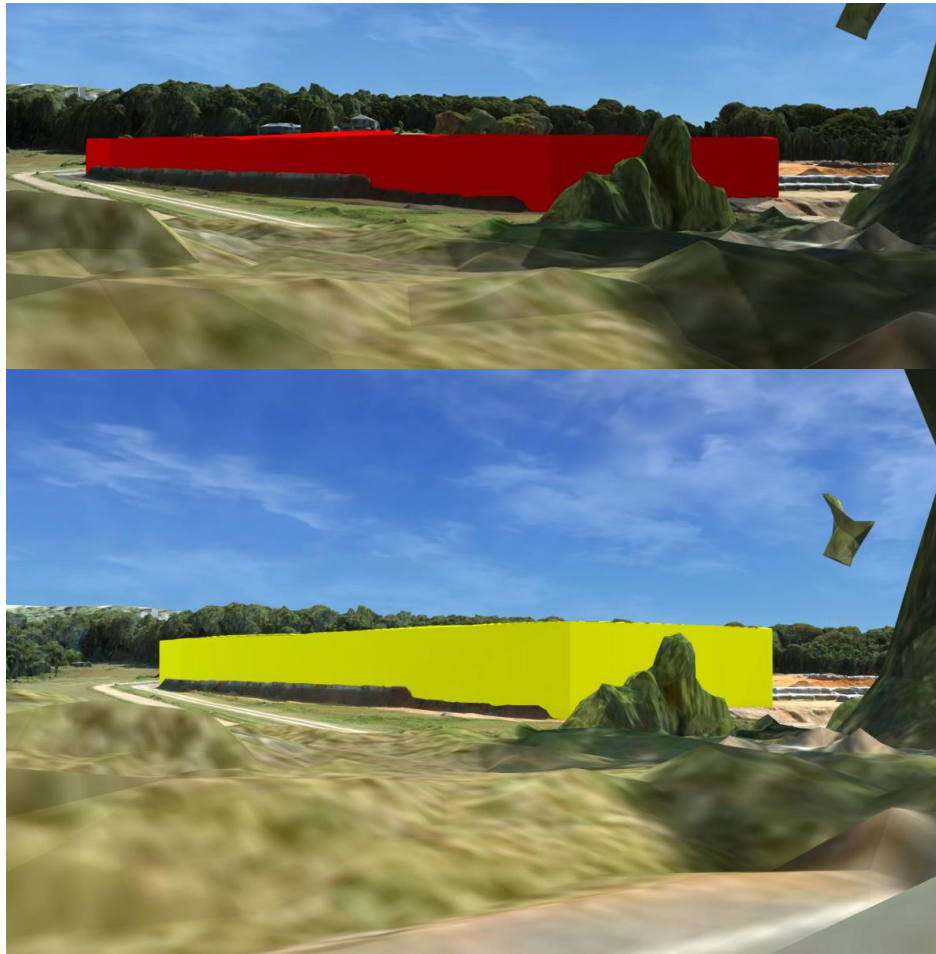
8.5m high (red) compared to 12m high (yellow) building as viewed from Whites Road south west toward the development site
